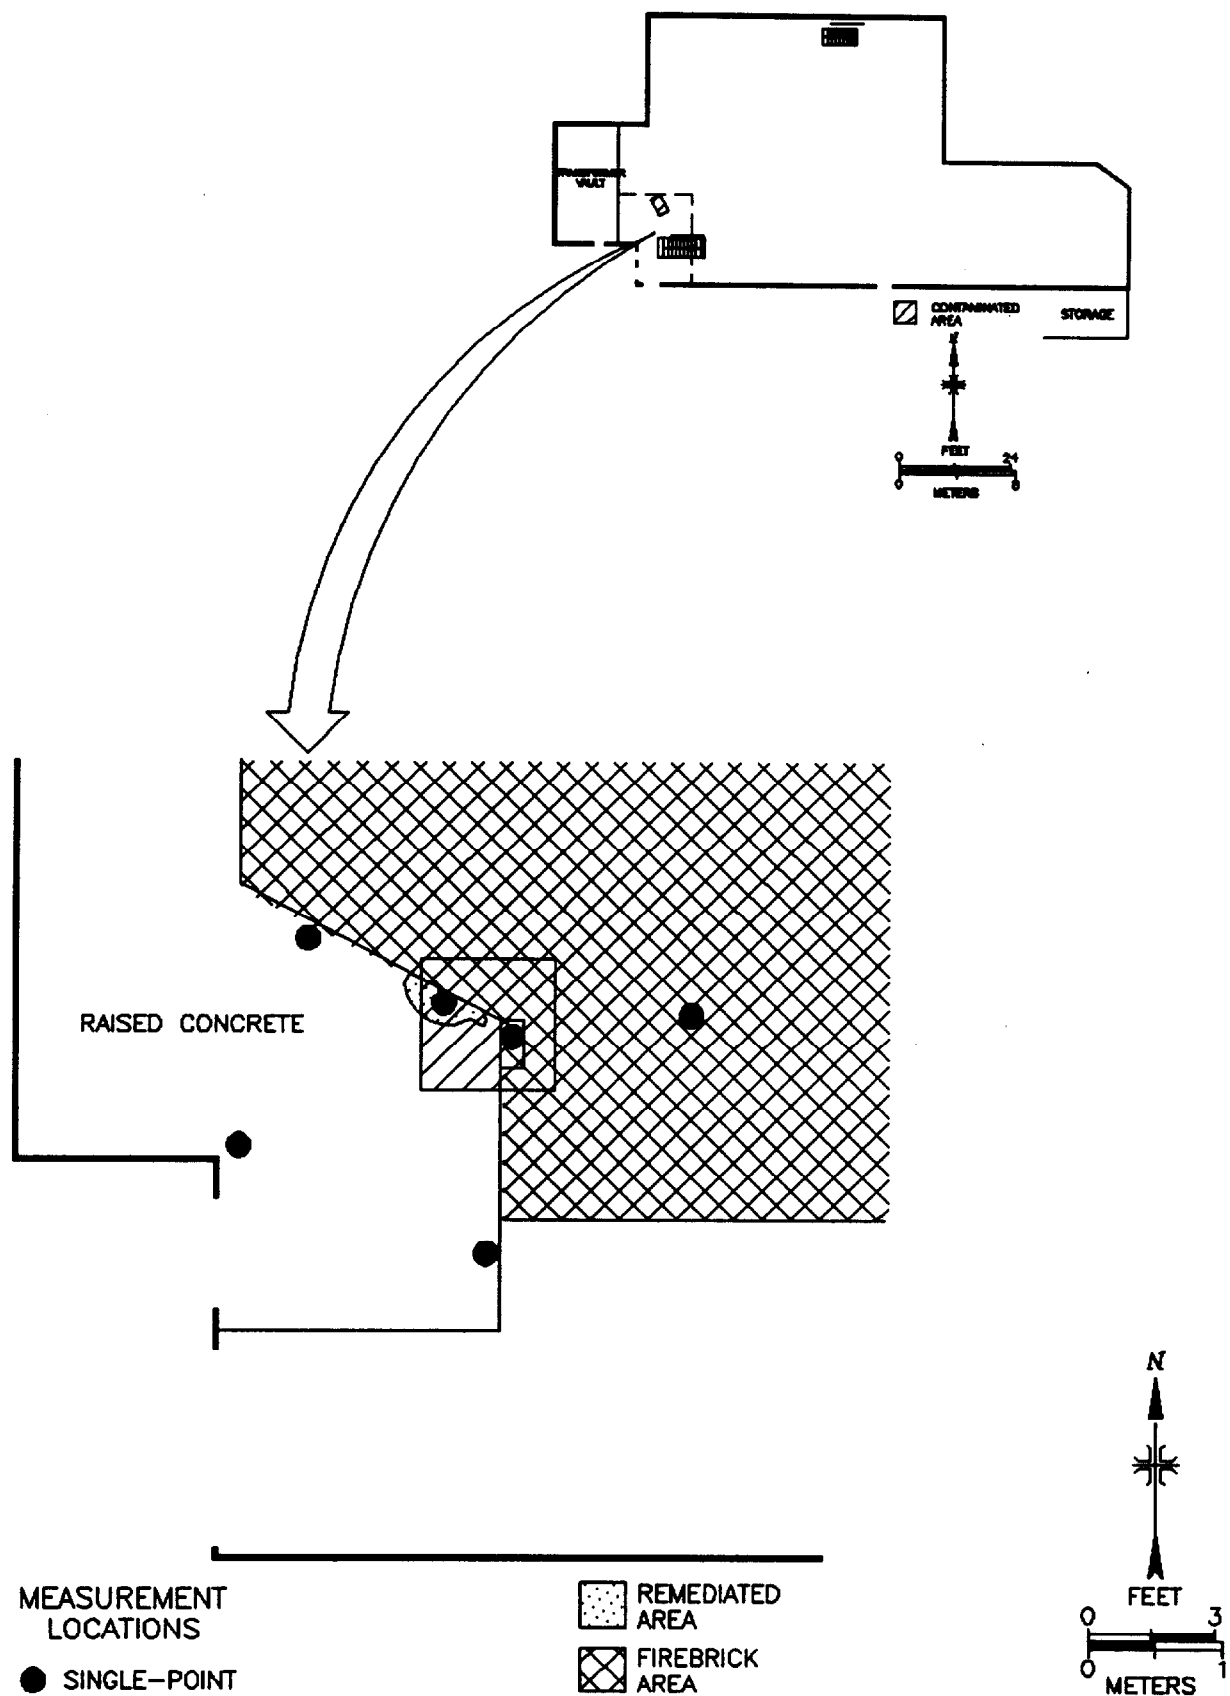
Building 25, First Floor, Southwest Corner — Remediated Area and Measurement Locations
